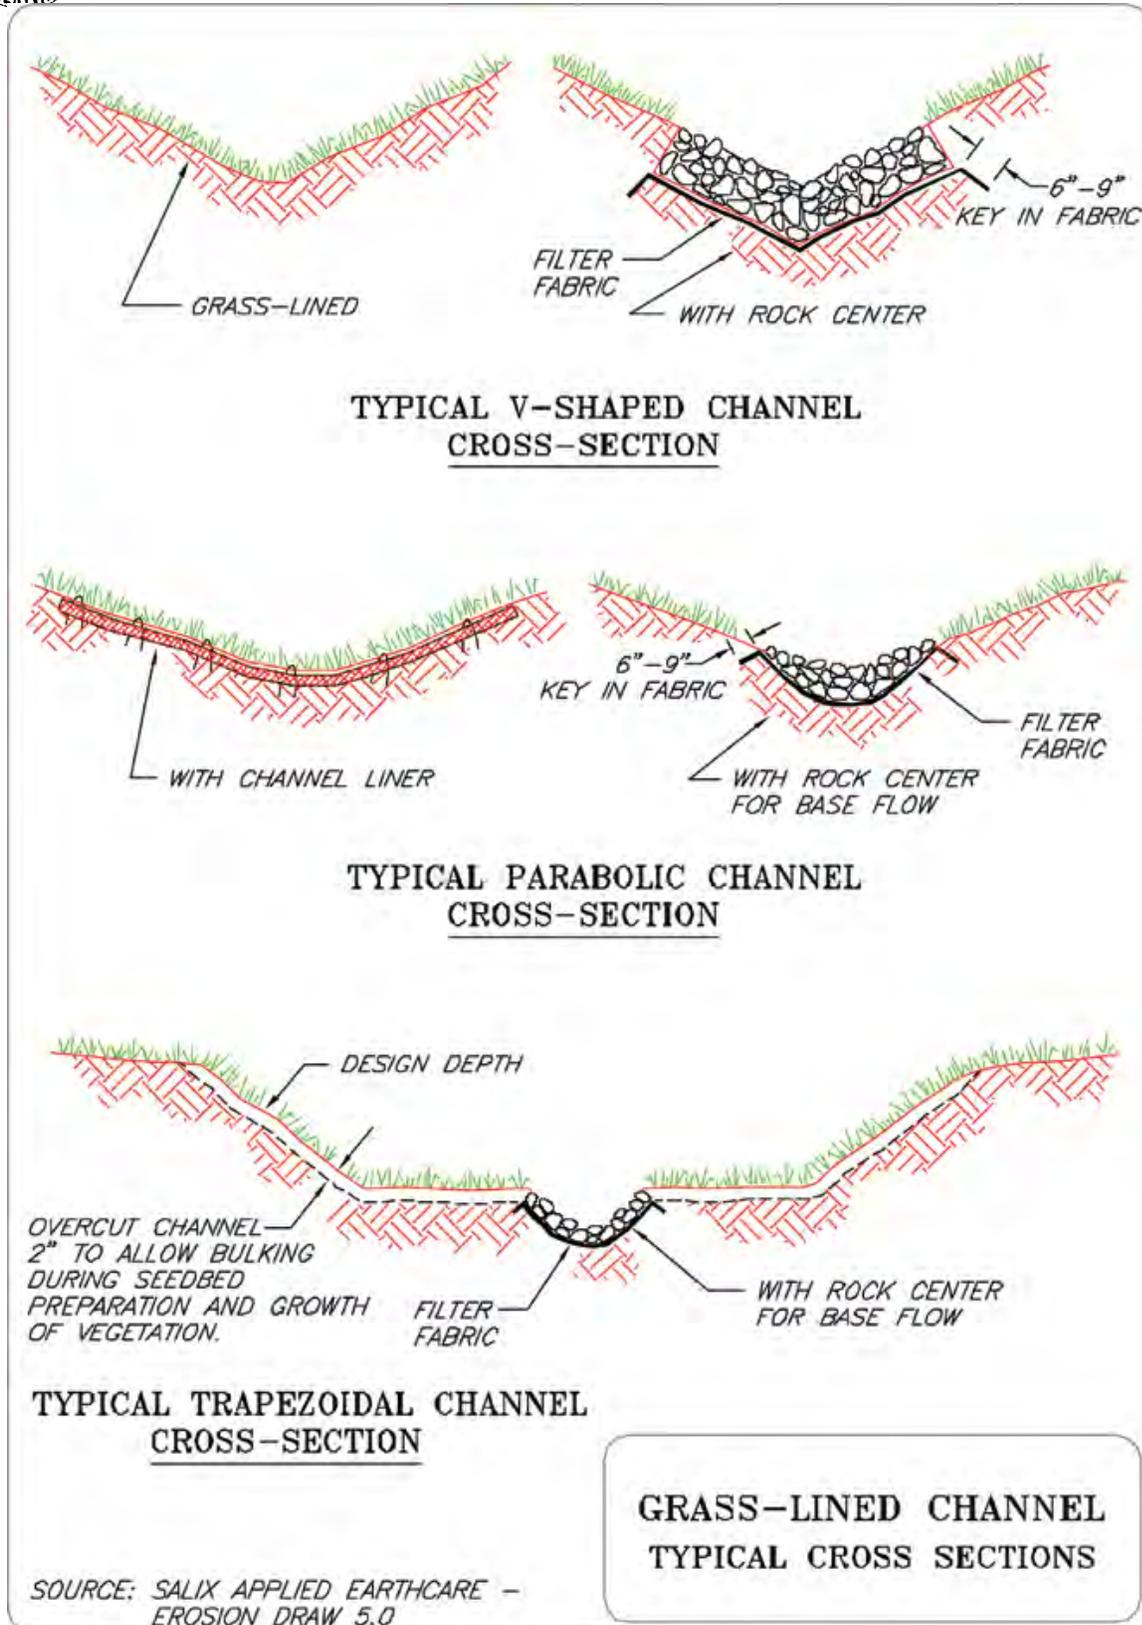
Typical Cross Sections for Grass Lined Channels
